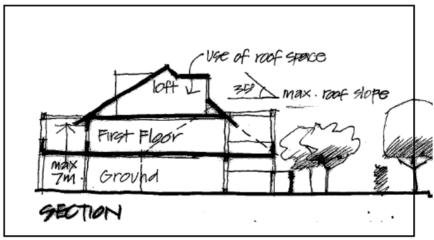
Section showing two storeys and the use of roof space in residential flat development
